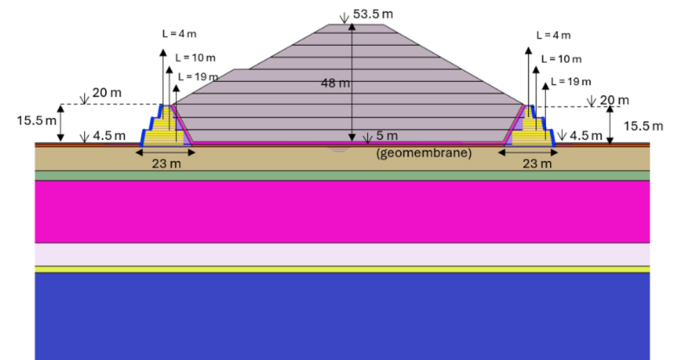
Analyzed landfill structure stabilized with Reinforced fill structure
